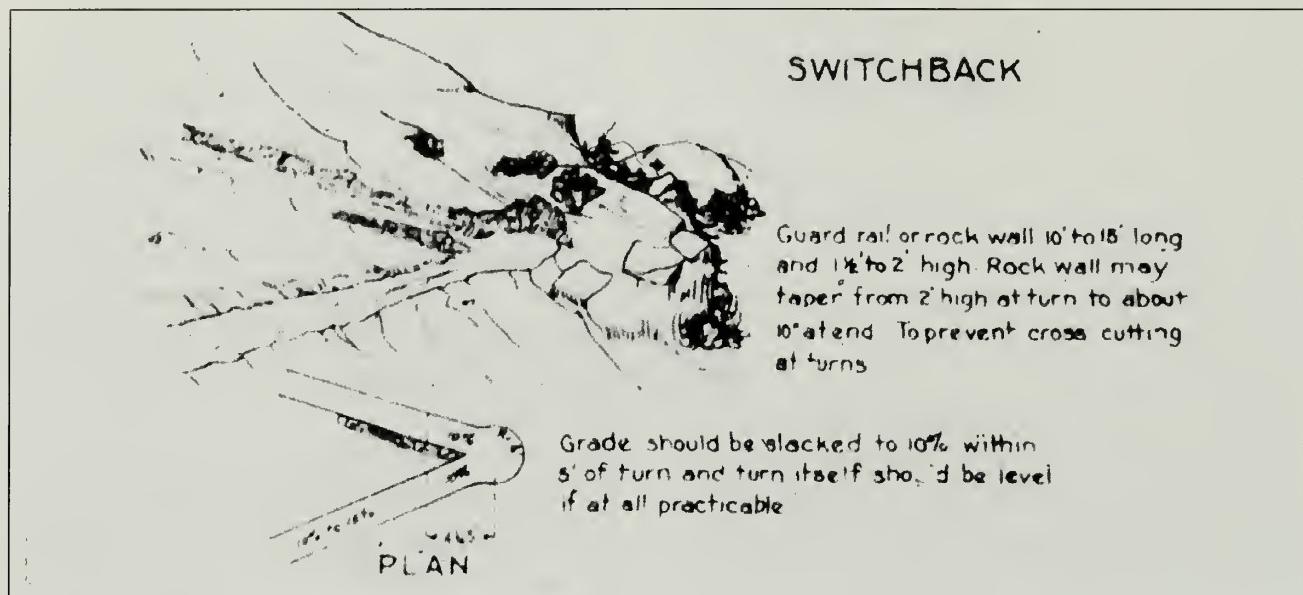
CCC details for laying out a series of switchbacks on a bench-cut trail.
